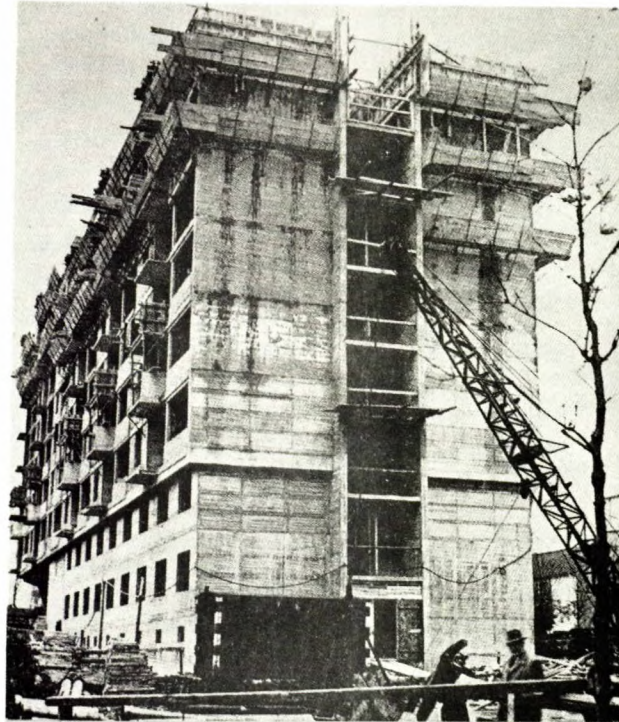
Multi-storey buildings under construction with no-fines concrete.
